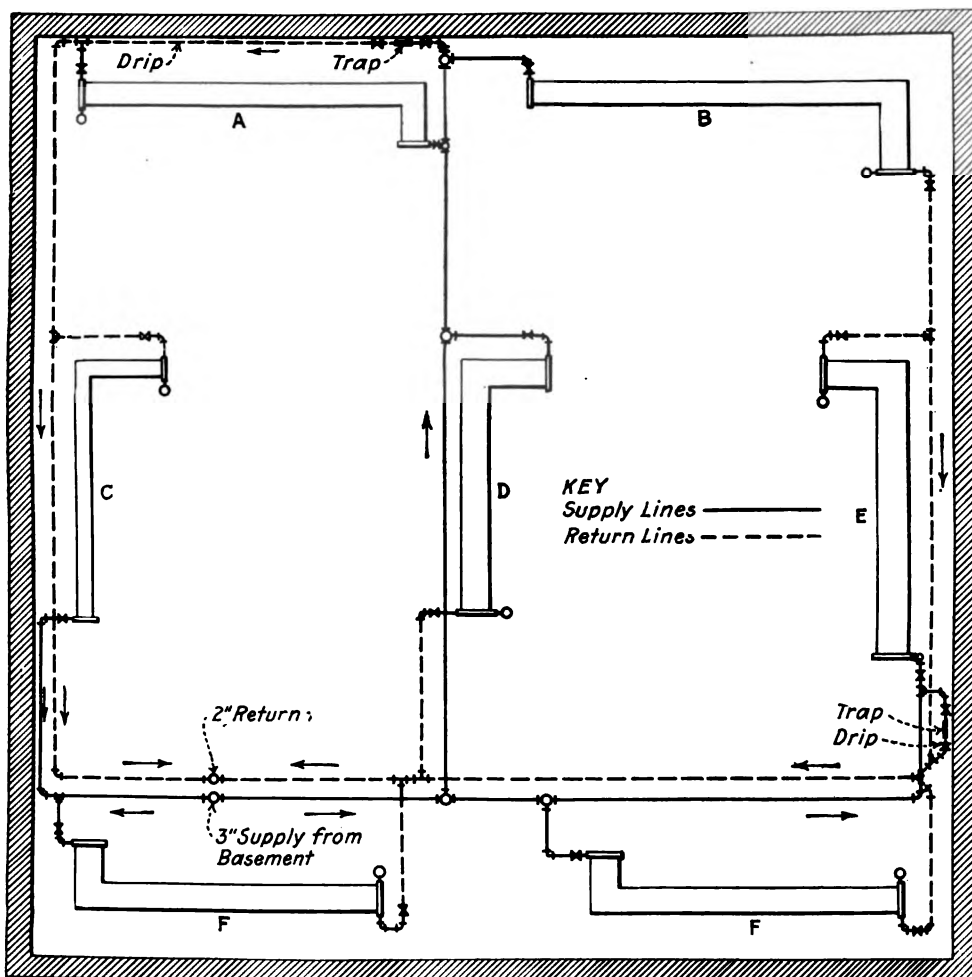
FIRST FLOOR PLAN. WRONG METHOD OF PIPING TO CEILING COILS.
